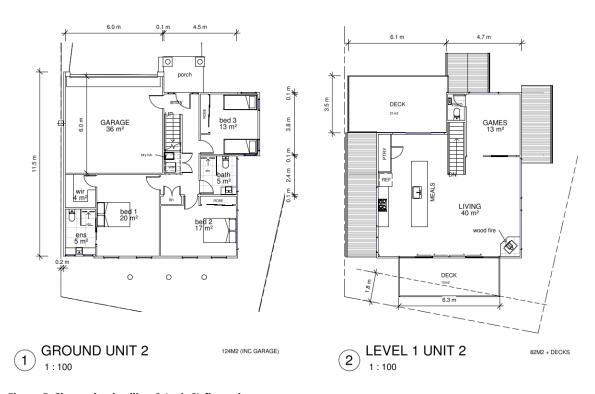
Shows the dwelling 2 (unit 2) floor plans.
